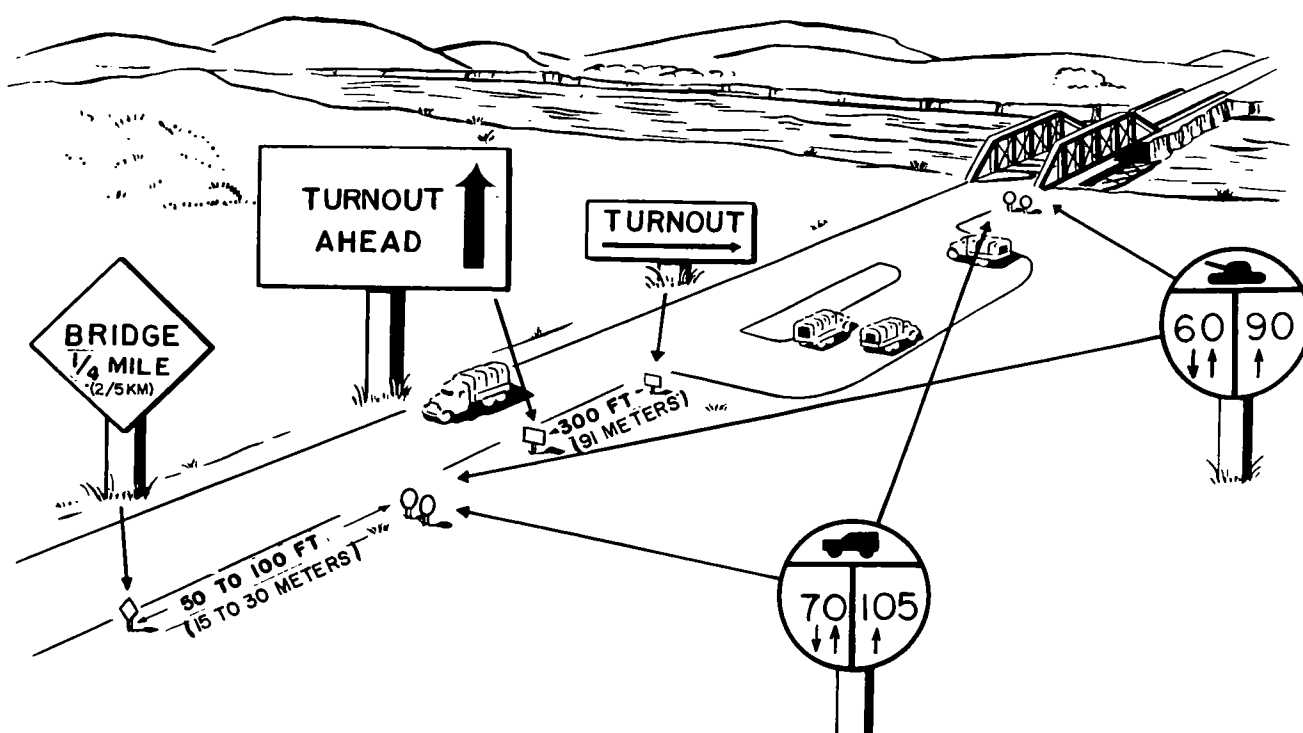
Typical arrangement of road-guide, information, and two-lane bridge-class signs.
